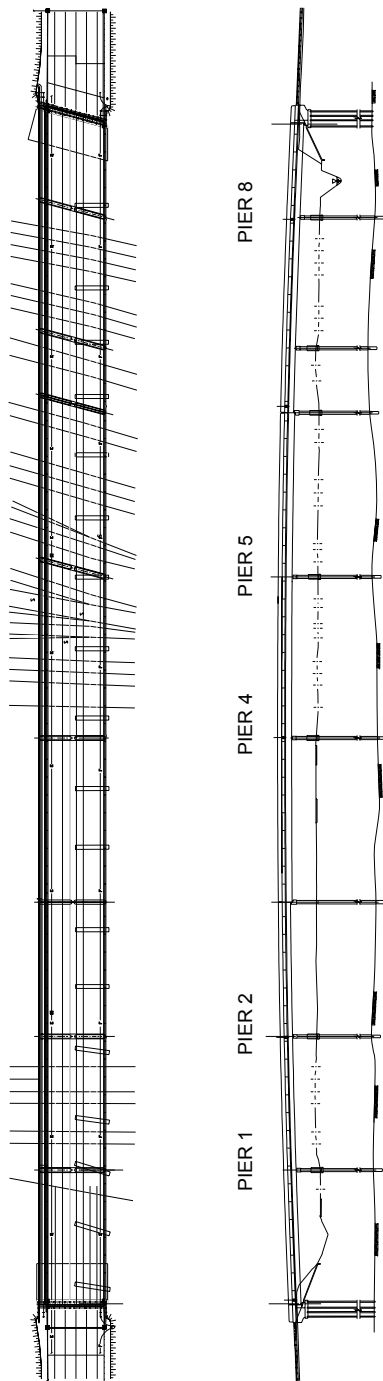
Doremus Avenue Bridge Layout and Location of Piers and Crosshole Test
